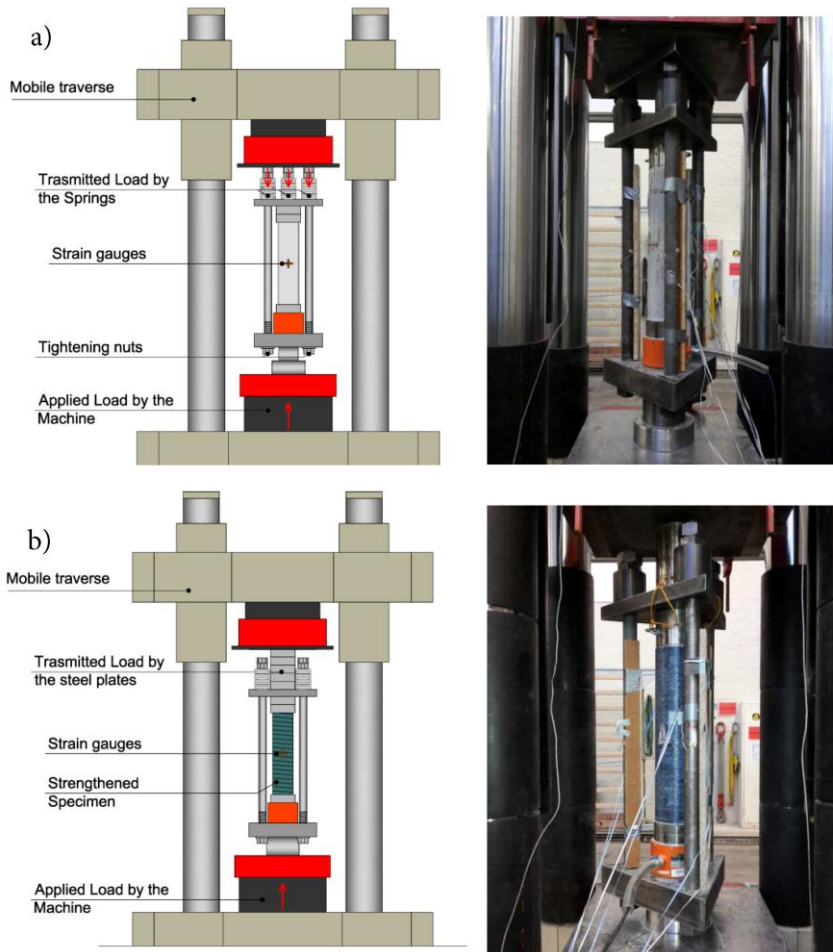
Arrangement of the tests scheme: preloading test (a); failure test (b).
